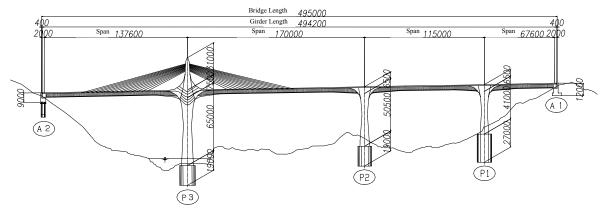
Elevation and Cross Section (A-Line bound for Tokyo)
